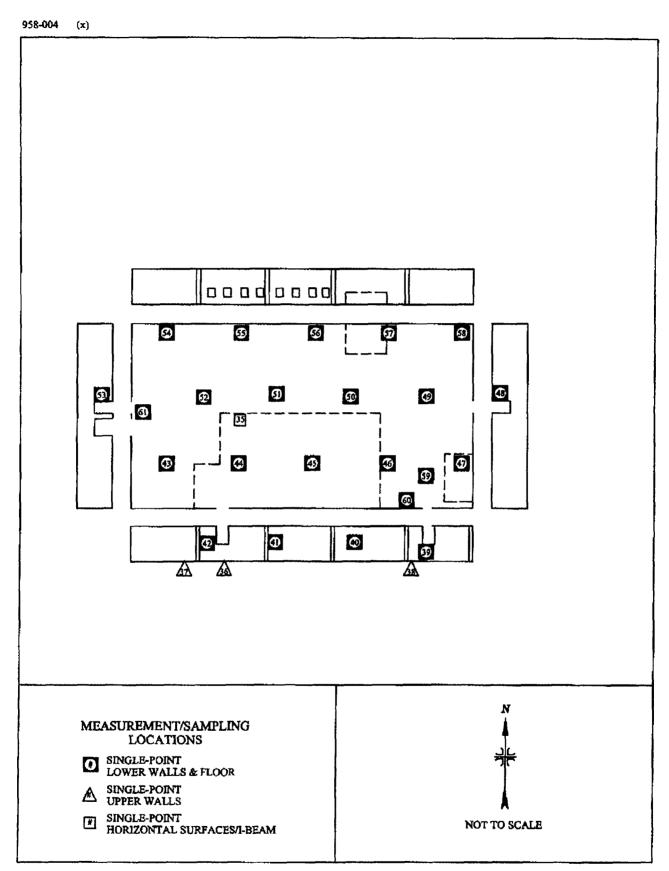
Building 865 Low Bay Area - Measurement and Sampling Locations
